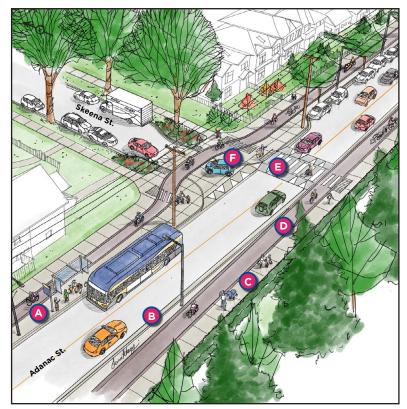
Proposed upgrades at Adanac Street and Skeena Street looking northeast.
